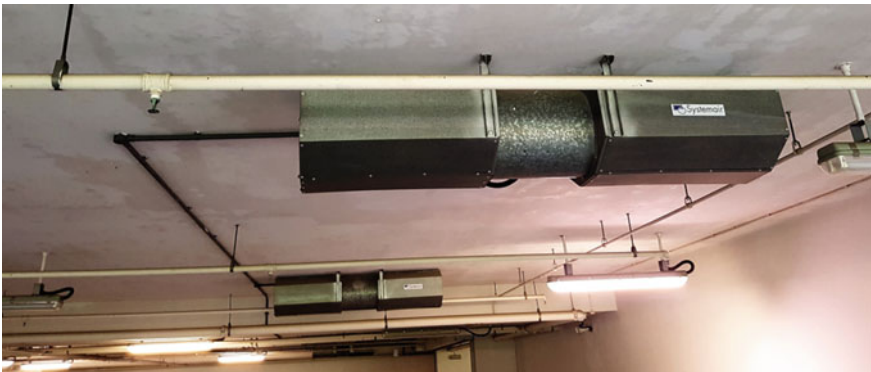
Photo of ductless jet fans installed in a car park of a building in Singapore
